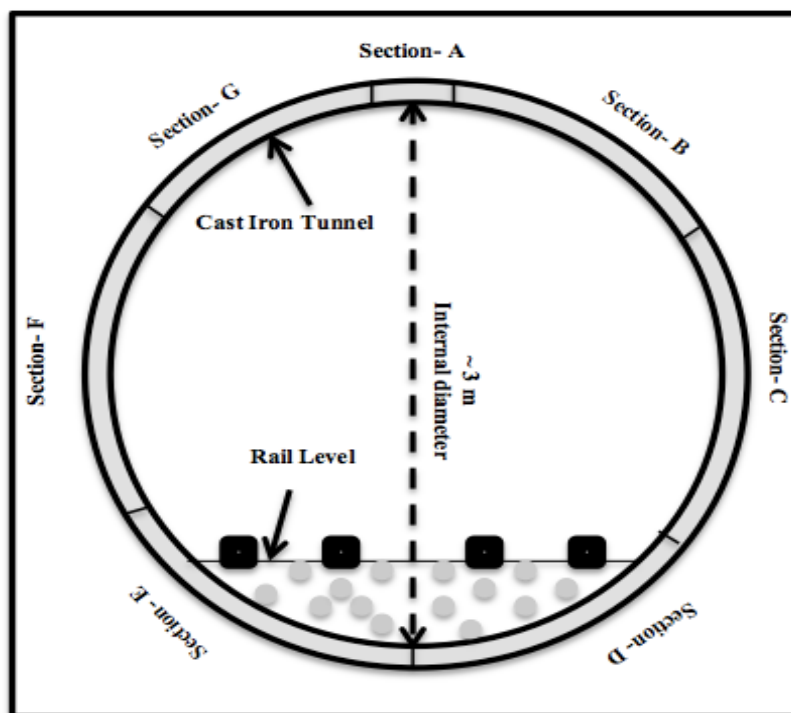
Cross-section of the tunnel under study, presently in an undeformed state.
